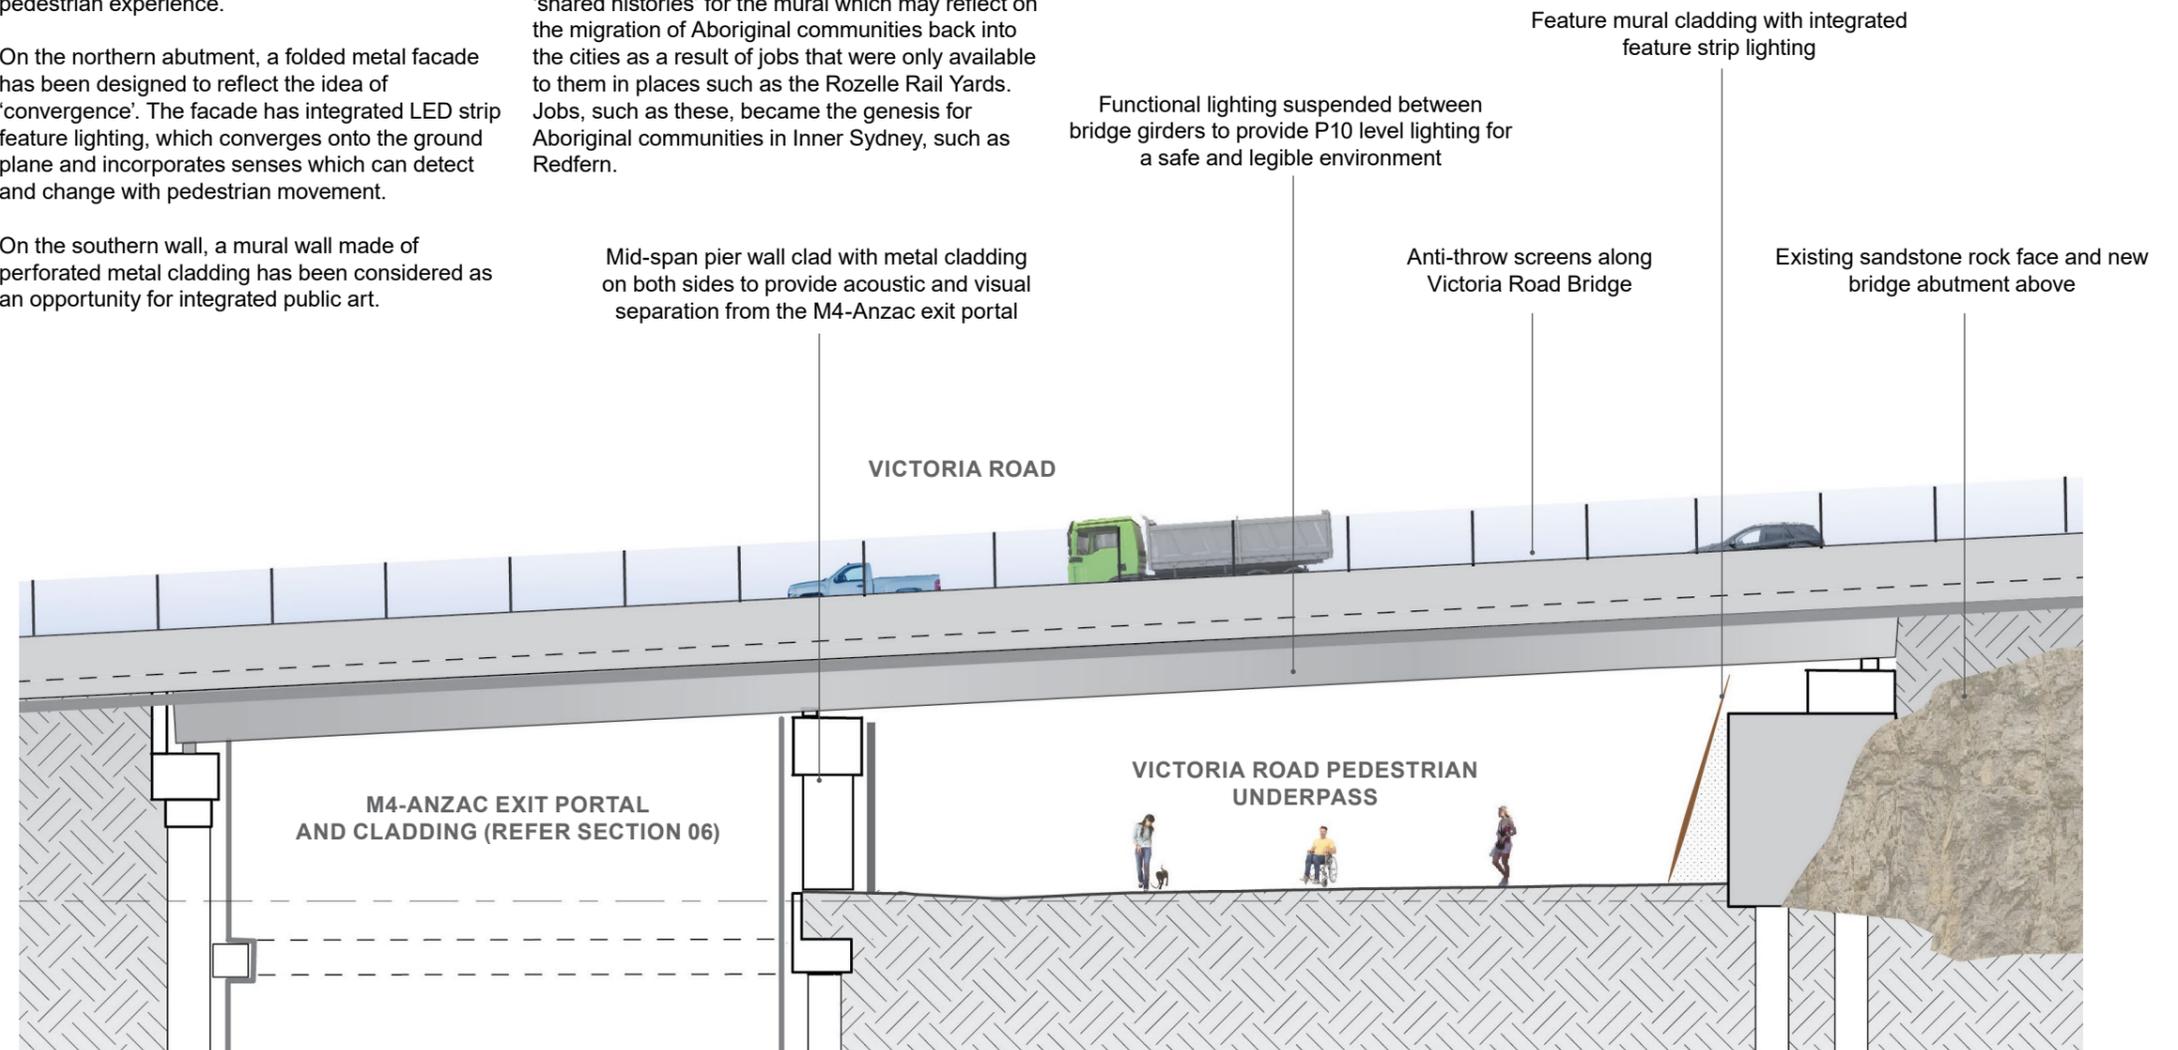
Rozelle Rail Yards - Victoria Road Pedestrian Underpass - typical cross section
